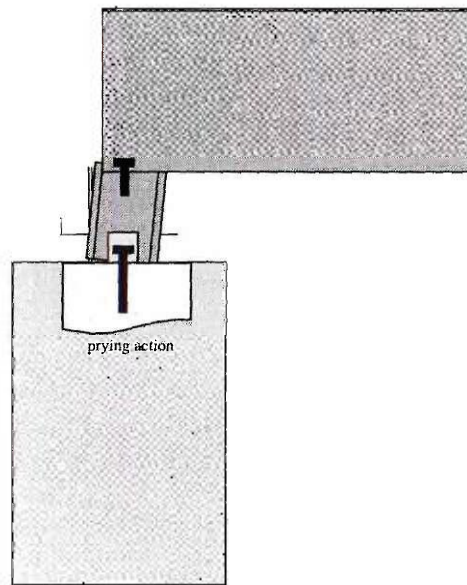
Prying-action of stud anchor bolts causing spalling or crushing of surrounding concrete
